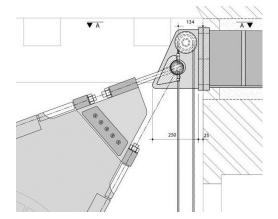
Connection of the cable to the membrane by using a sleeve [42].
